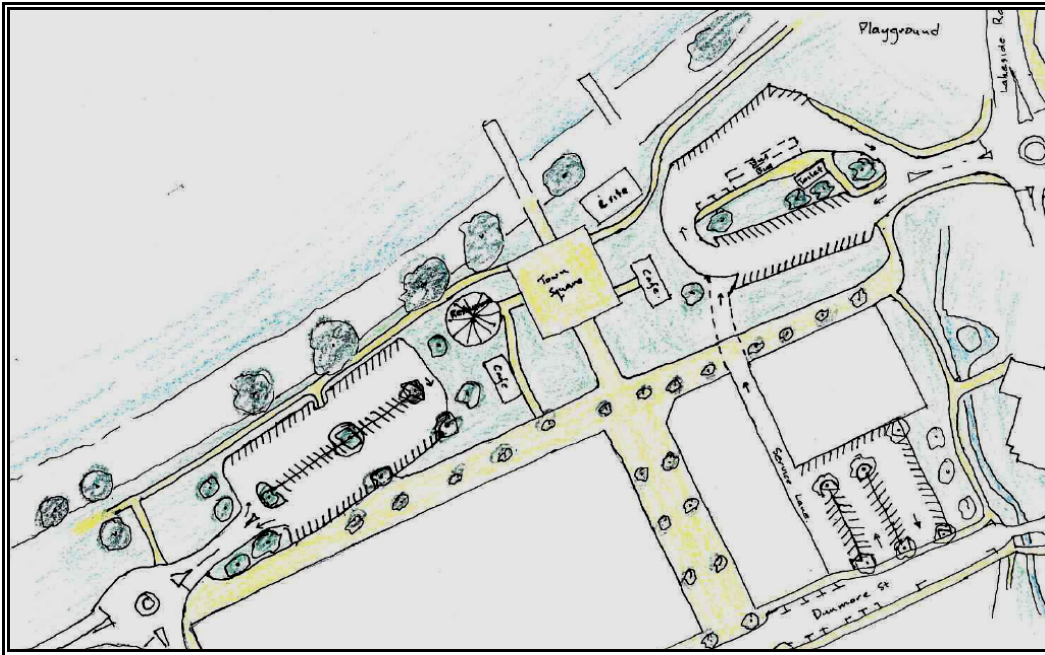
Eliminate parking in the reserve and slipways to the commercial frontage and replace with roadside parking on Ardmore Street. (Parking layout is indicative only).
